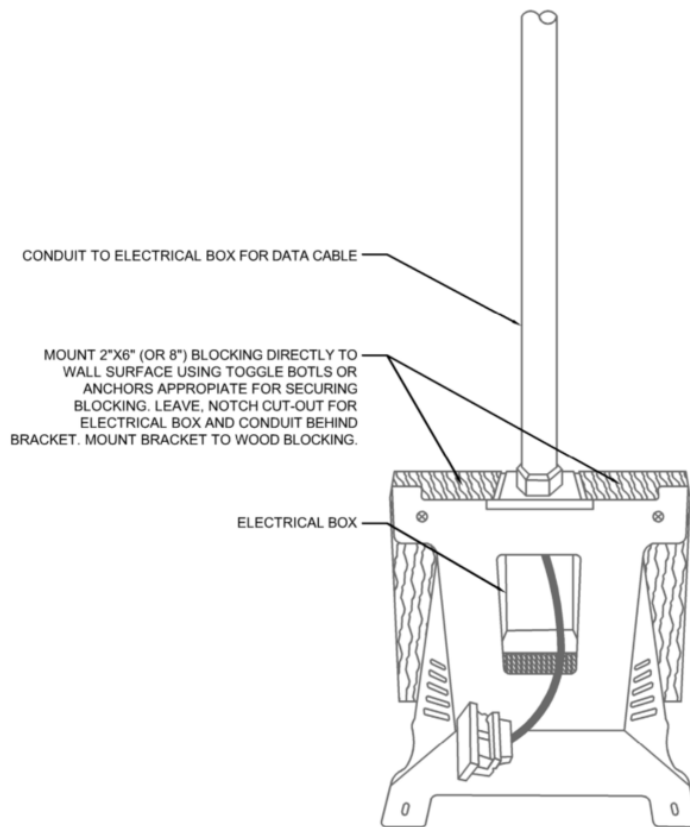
15 00-05 Bio Clock Mounting Detail – Blocking
